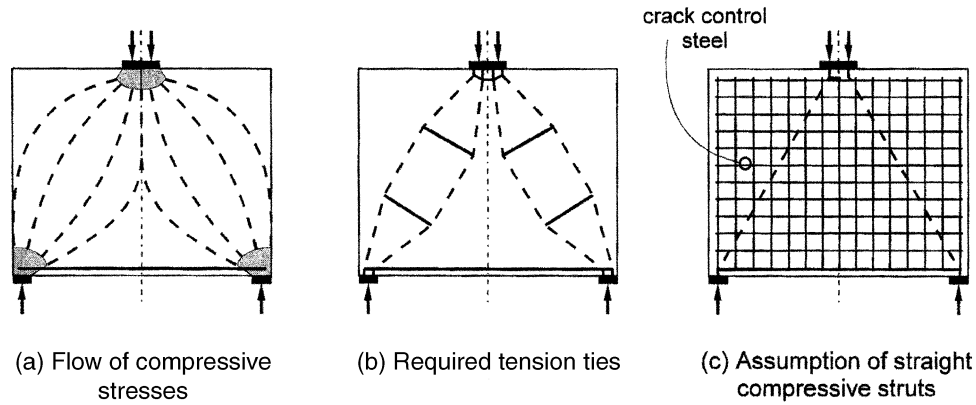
Crack control reinforcement required with assumed straight-line compressive struts, adapted from Schlaich et al. (1987).
